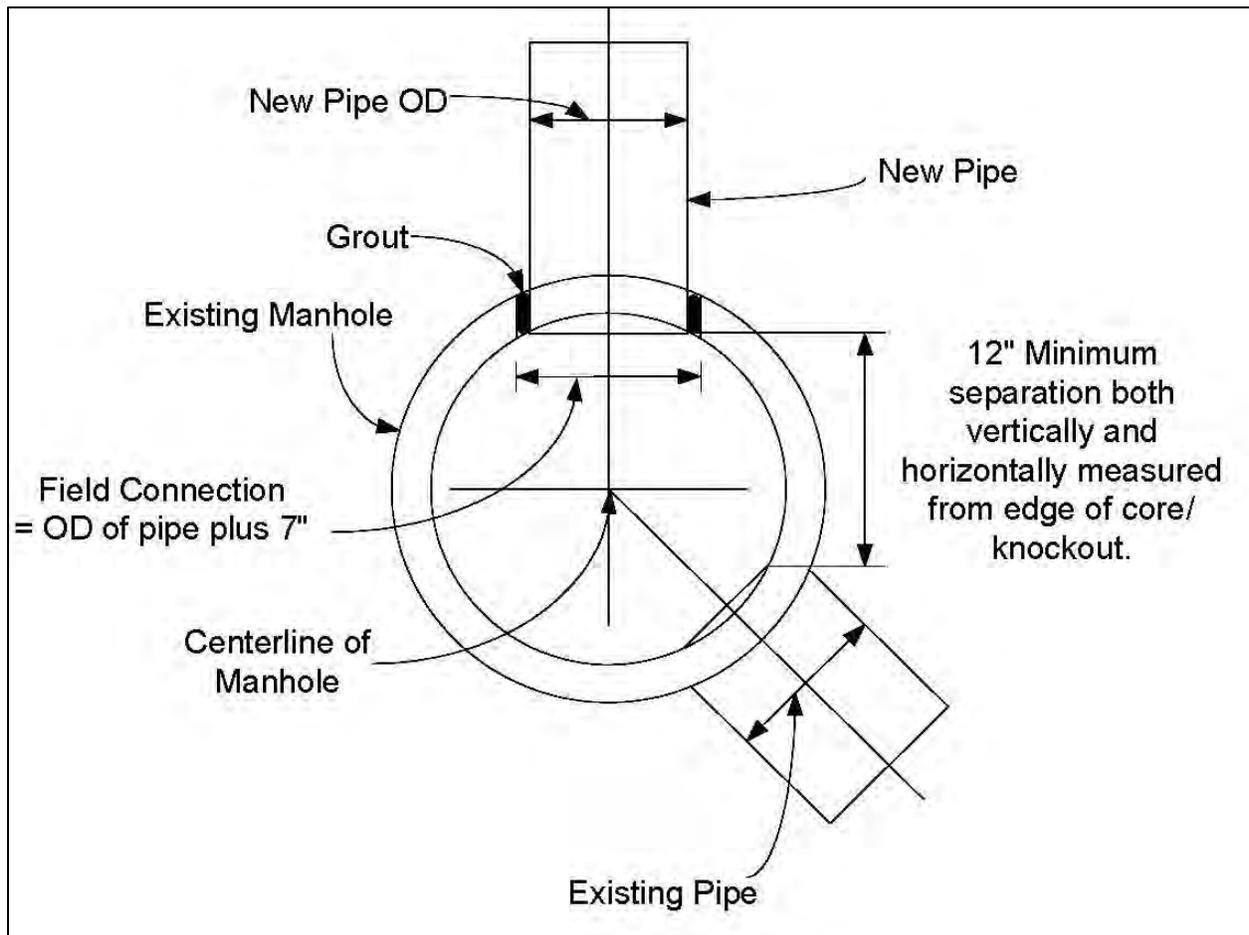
New Pipe Connection to an Existing Manhole⁴⁴
